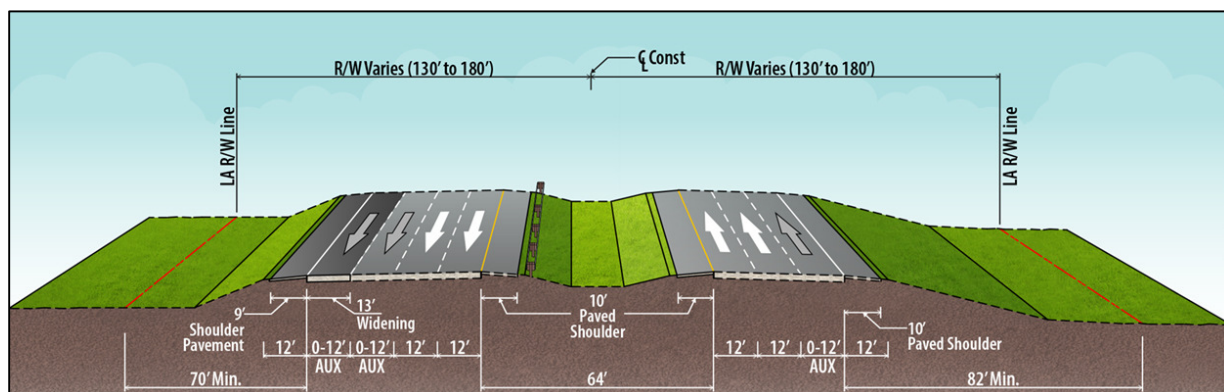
I-275 Mainline Build Alternative Typical Section from south of 54th Avenue I-175 (Segment A)
